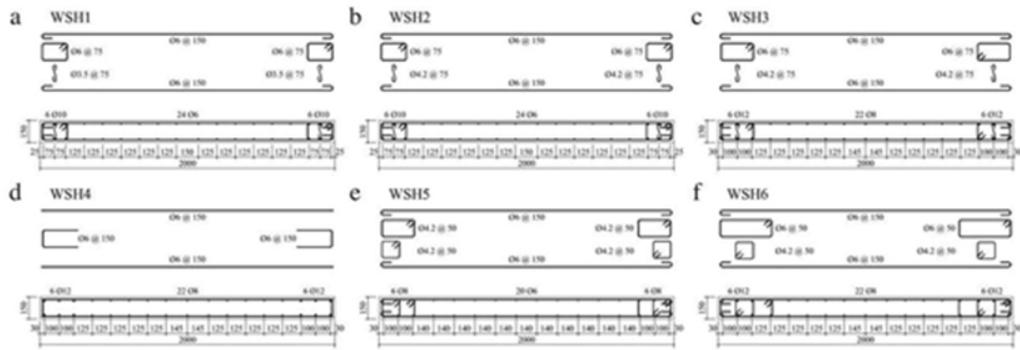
Reinforced layout in the plastic zone of test units, all dimensions in [mm] (Tahoni, 2004)
